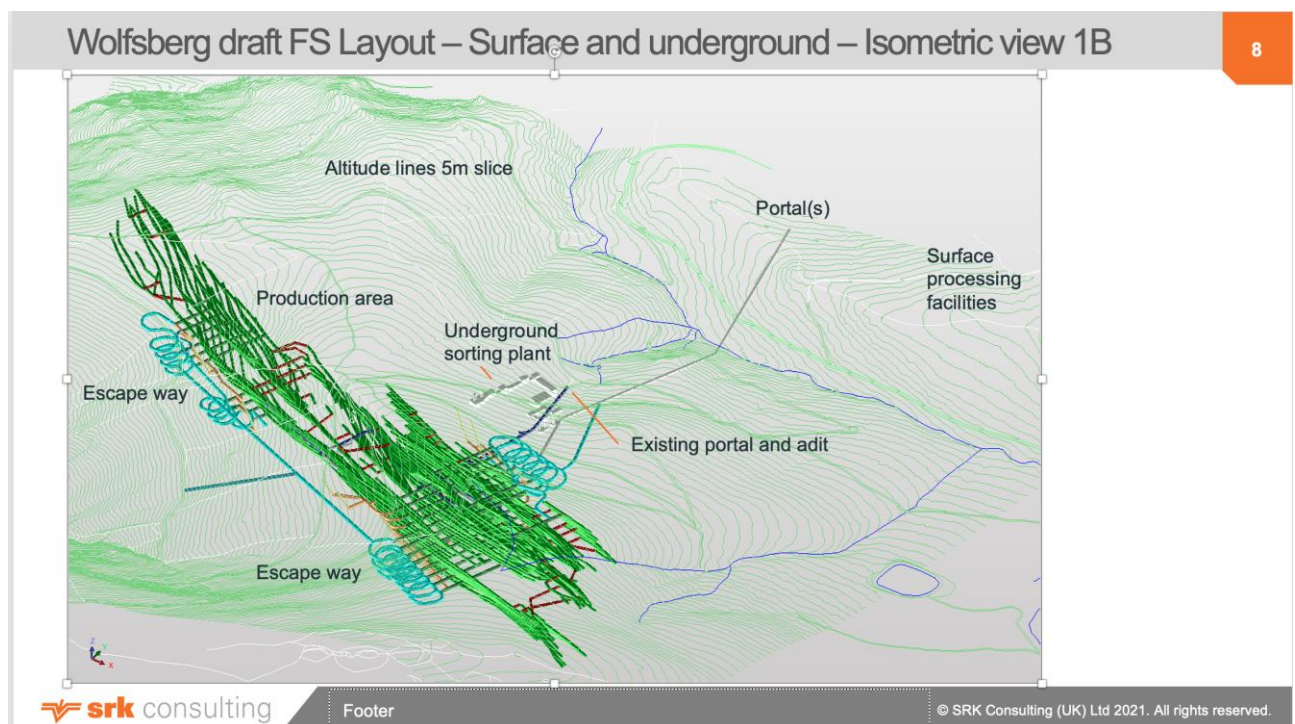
Draft DFS Layout - Surface & Underground - isometric view
